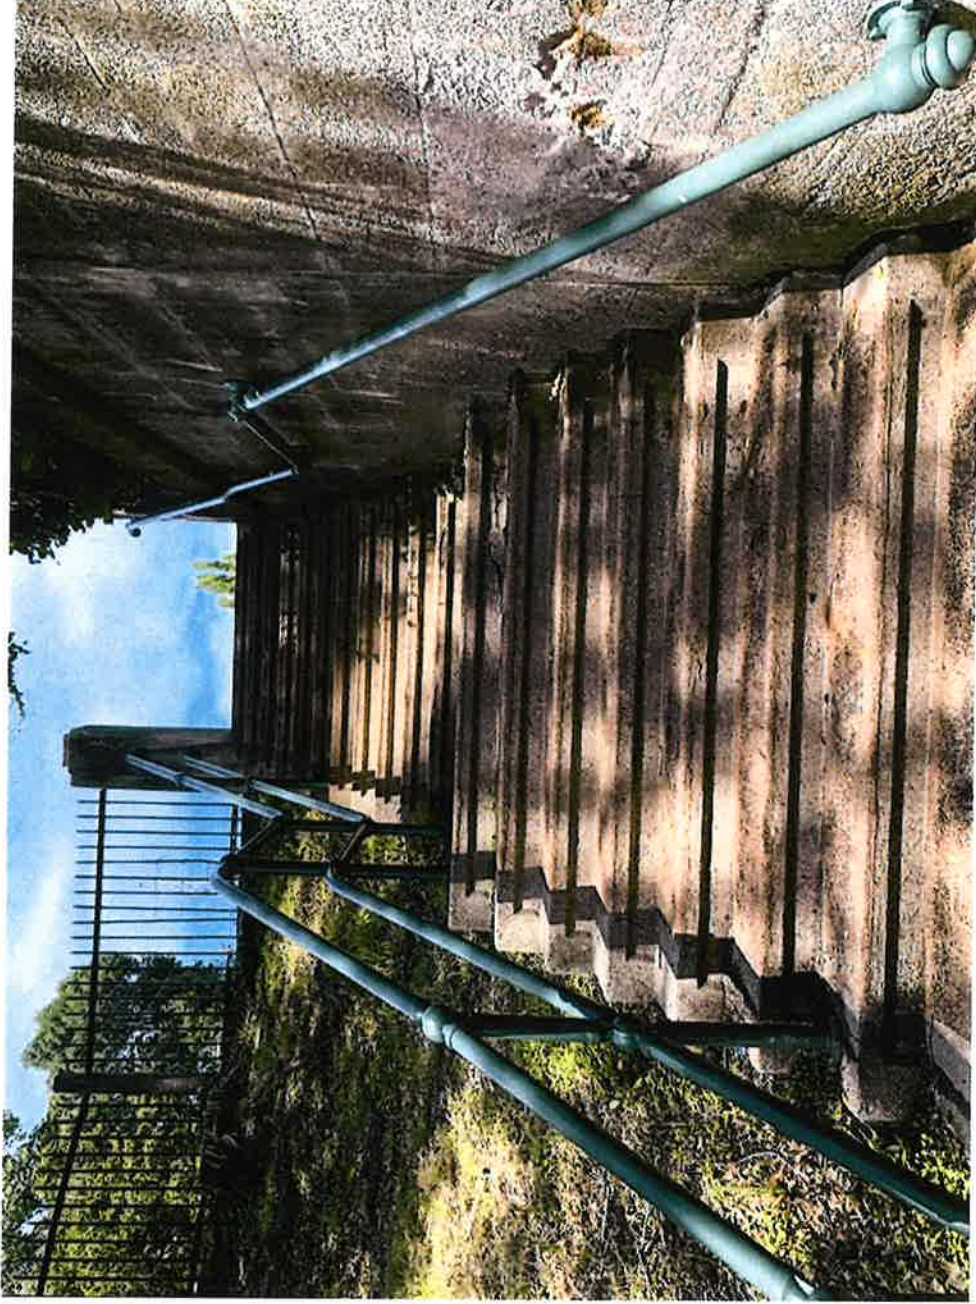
NORTH SIDE ACCESS STAIRWAY
